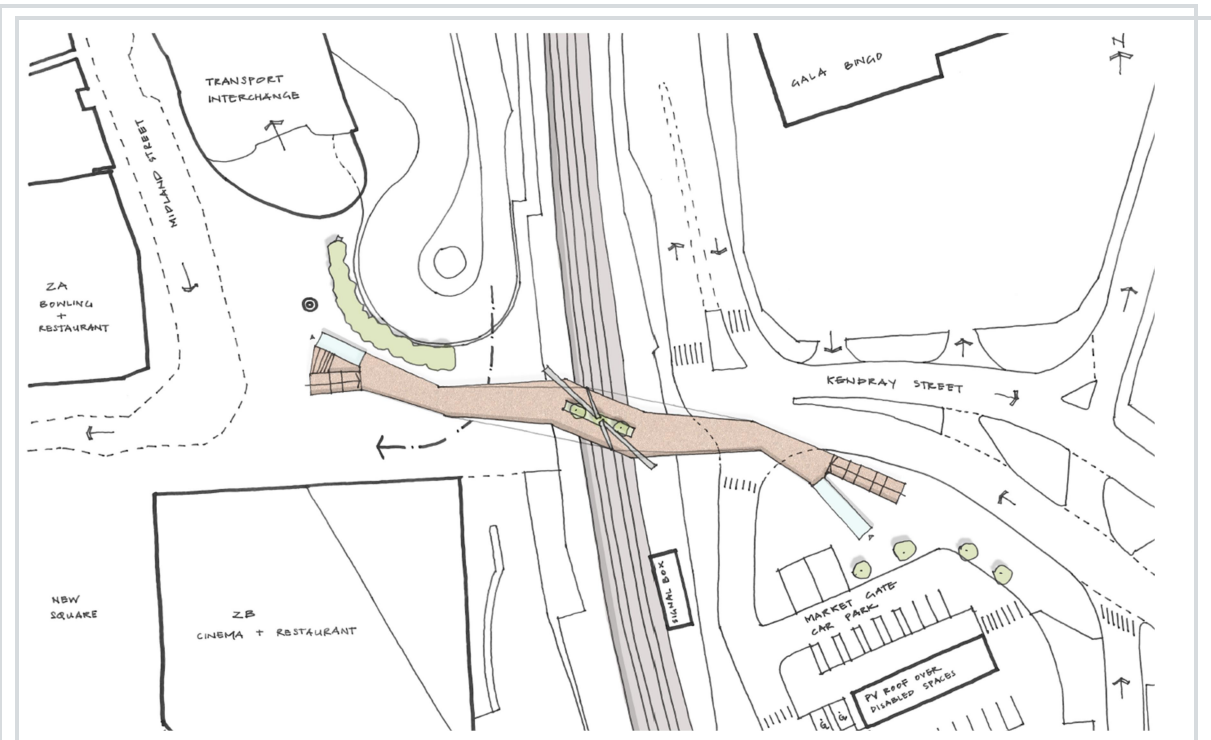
Proposed Market Gate Bridge (source: IBI Group and Benedetti Architects Brochure (Jan 18))
